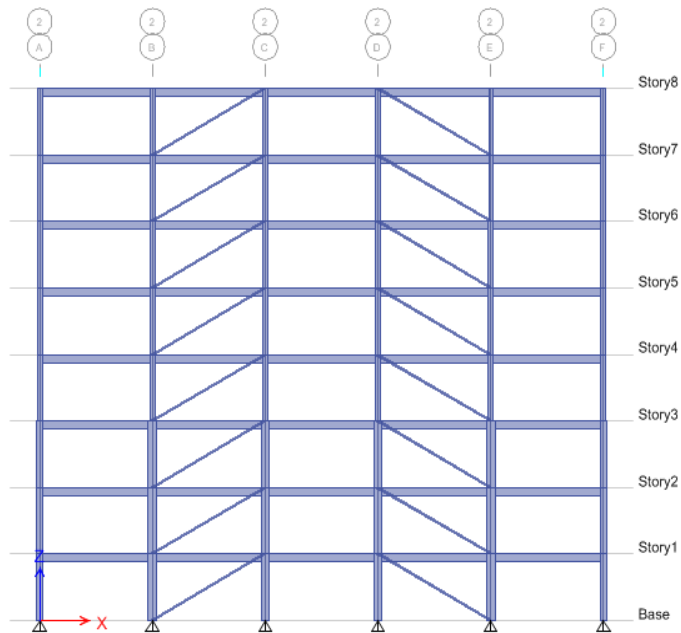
Typical truss beam and bracing elevation of the dormitory building (RB-T) in x-direction.
